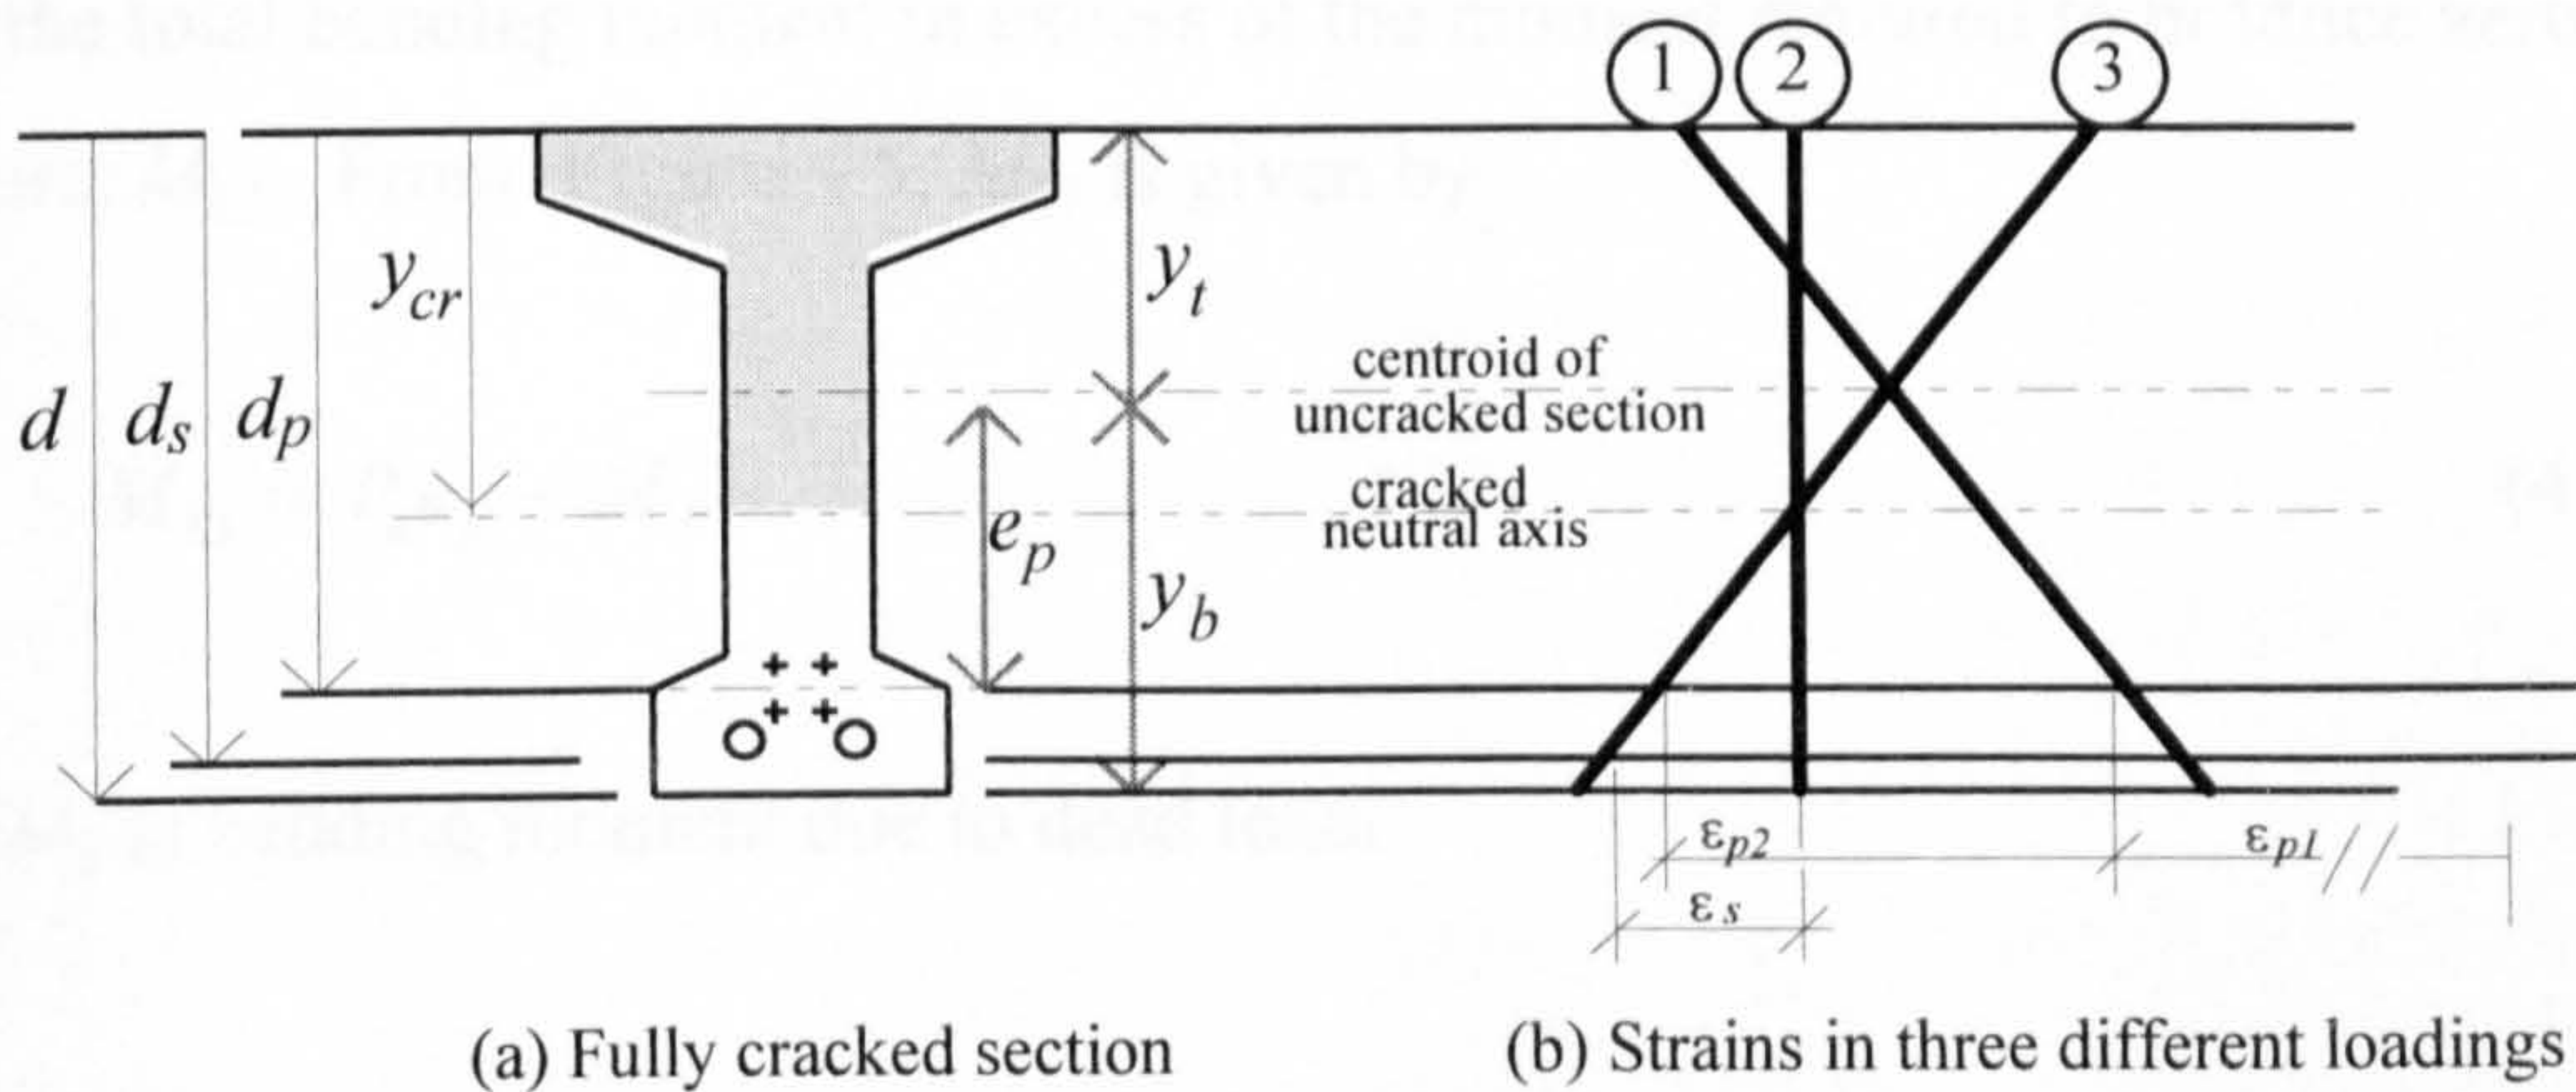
Basis of analysis for cracked prestressed concrete sections
